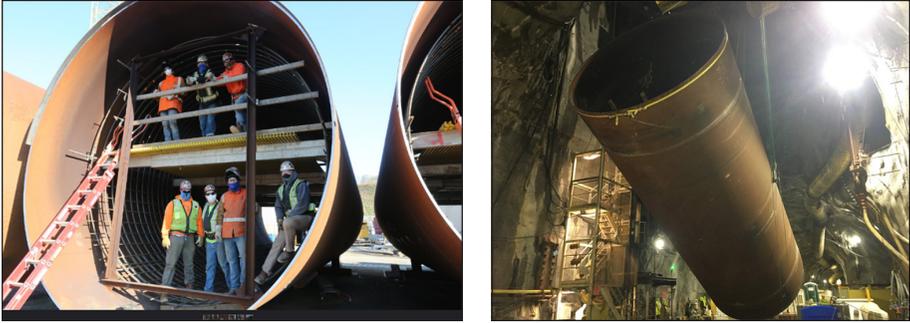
Interliner Section Fit Out and Lowering into the Tunnel
